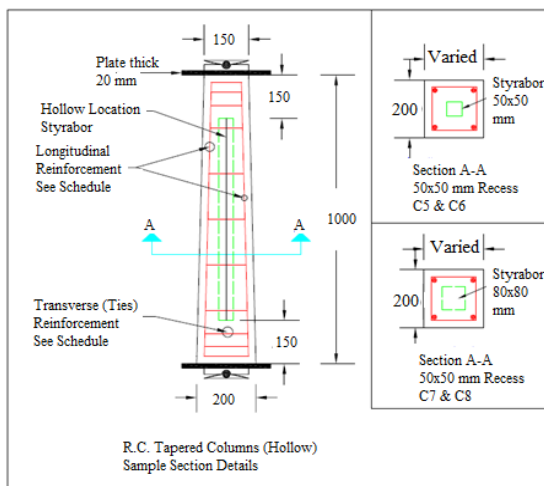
Dimension and Details of R.C. Tapered Columns (Hollow Section) [16].
